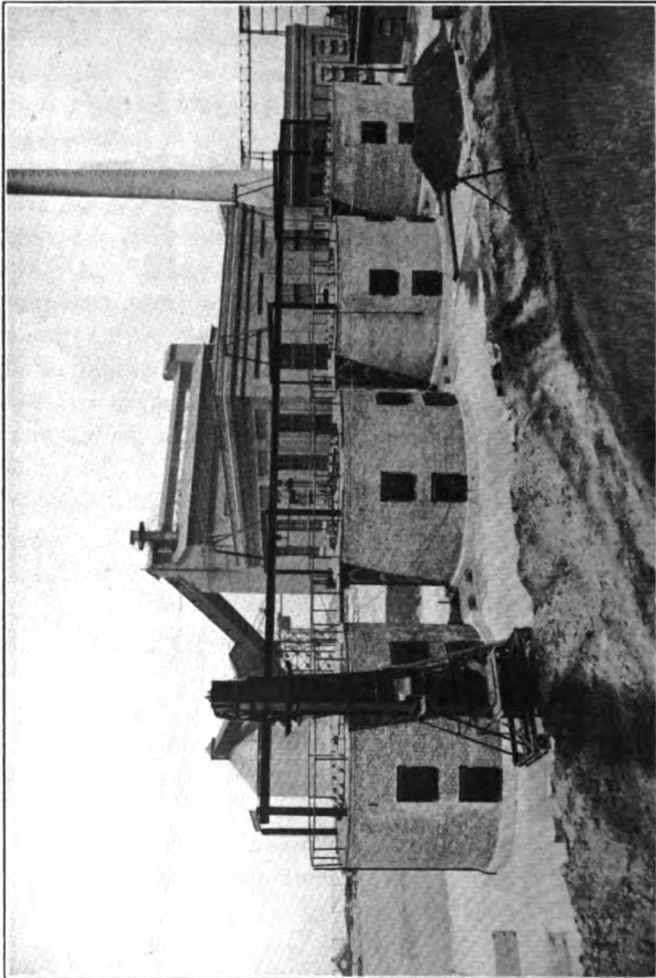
(No. 16-a) Completed installation. Note oxide elevator. The sides of these boxes are insulated with a 9-inch brick wall kept 2 inches from the steel. Granular ring is filled with ground cork. Covers are insulated with slab asbestos.
